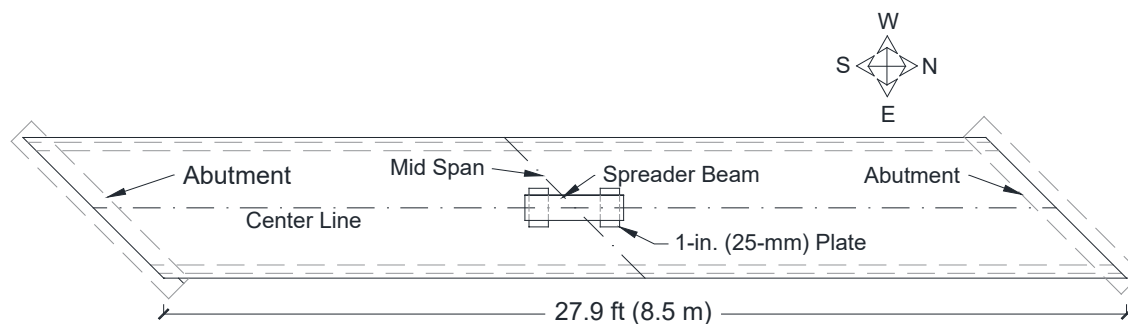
Point Loads in Plan View of 30-ft (9.14-m) Long Girder
